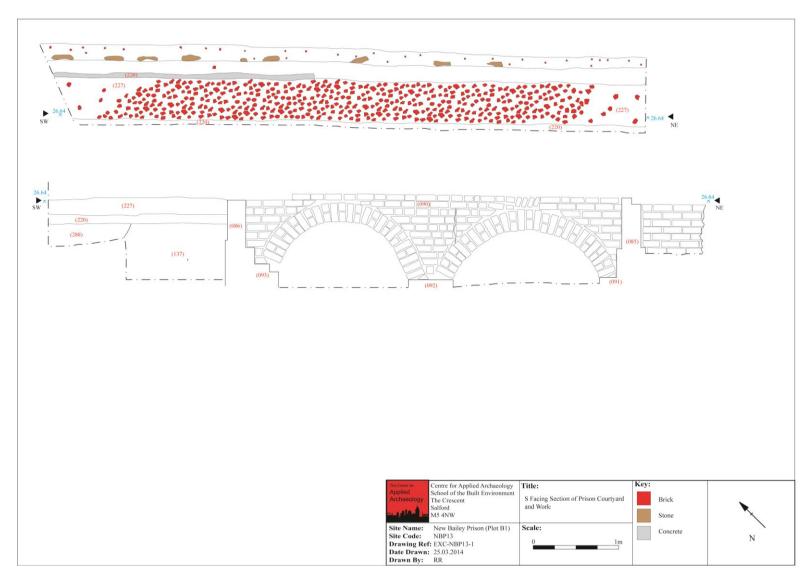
South facing section of Prison Courtyard area and internal workshop dividing wall (090), Trench 5
